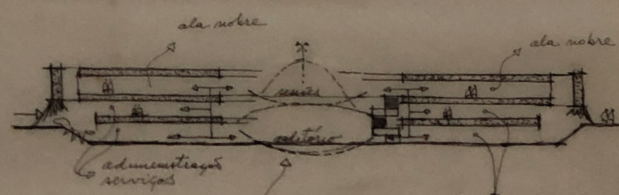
First page applied to the first floor plan. Decio Tozzi, Collection BAE, Unicamp.
